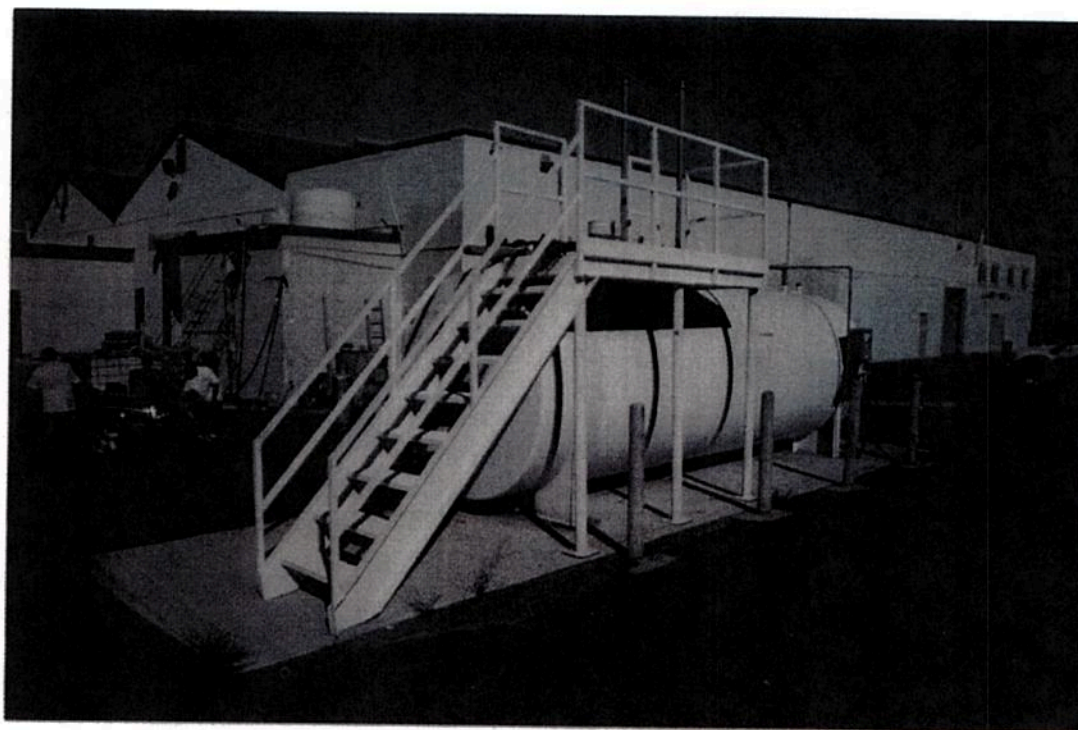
Closeup of 6,000-gallon aboveground storage tank.
